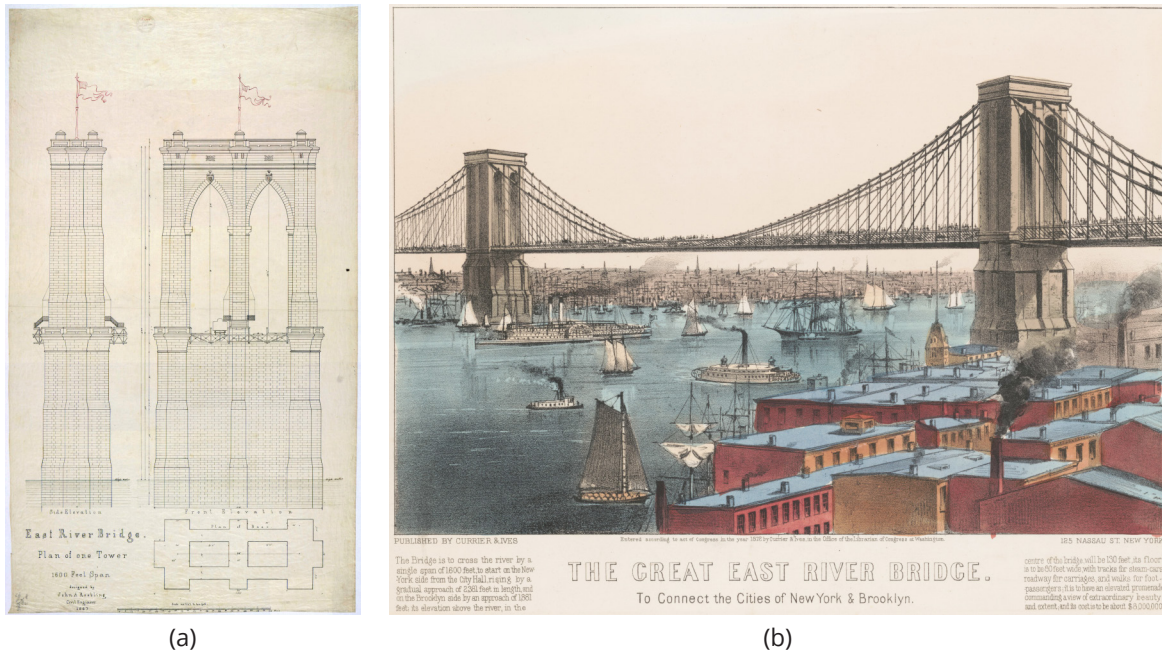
(a) Plan of the Brooklyn Bridge Tower, 1867; (b) Expected view of the bridge.
